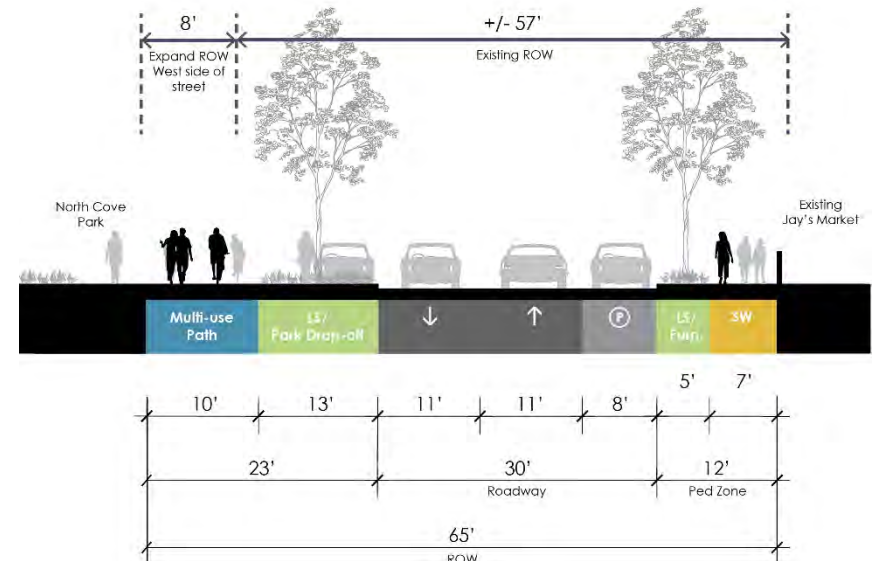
Retail Street Illustration (Main Street View Looking North Between Lakeshore Dr. NE and 18th St. NE)
